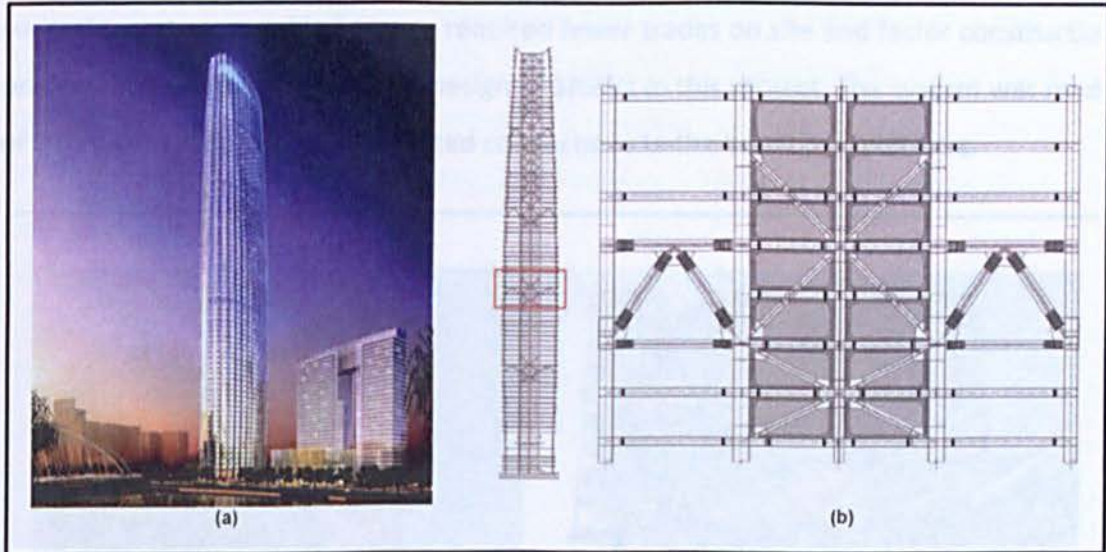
(a) The architectural impression (b) Outrigger truss of Jinta tower
